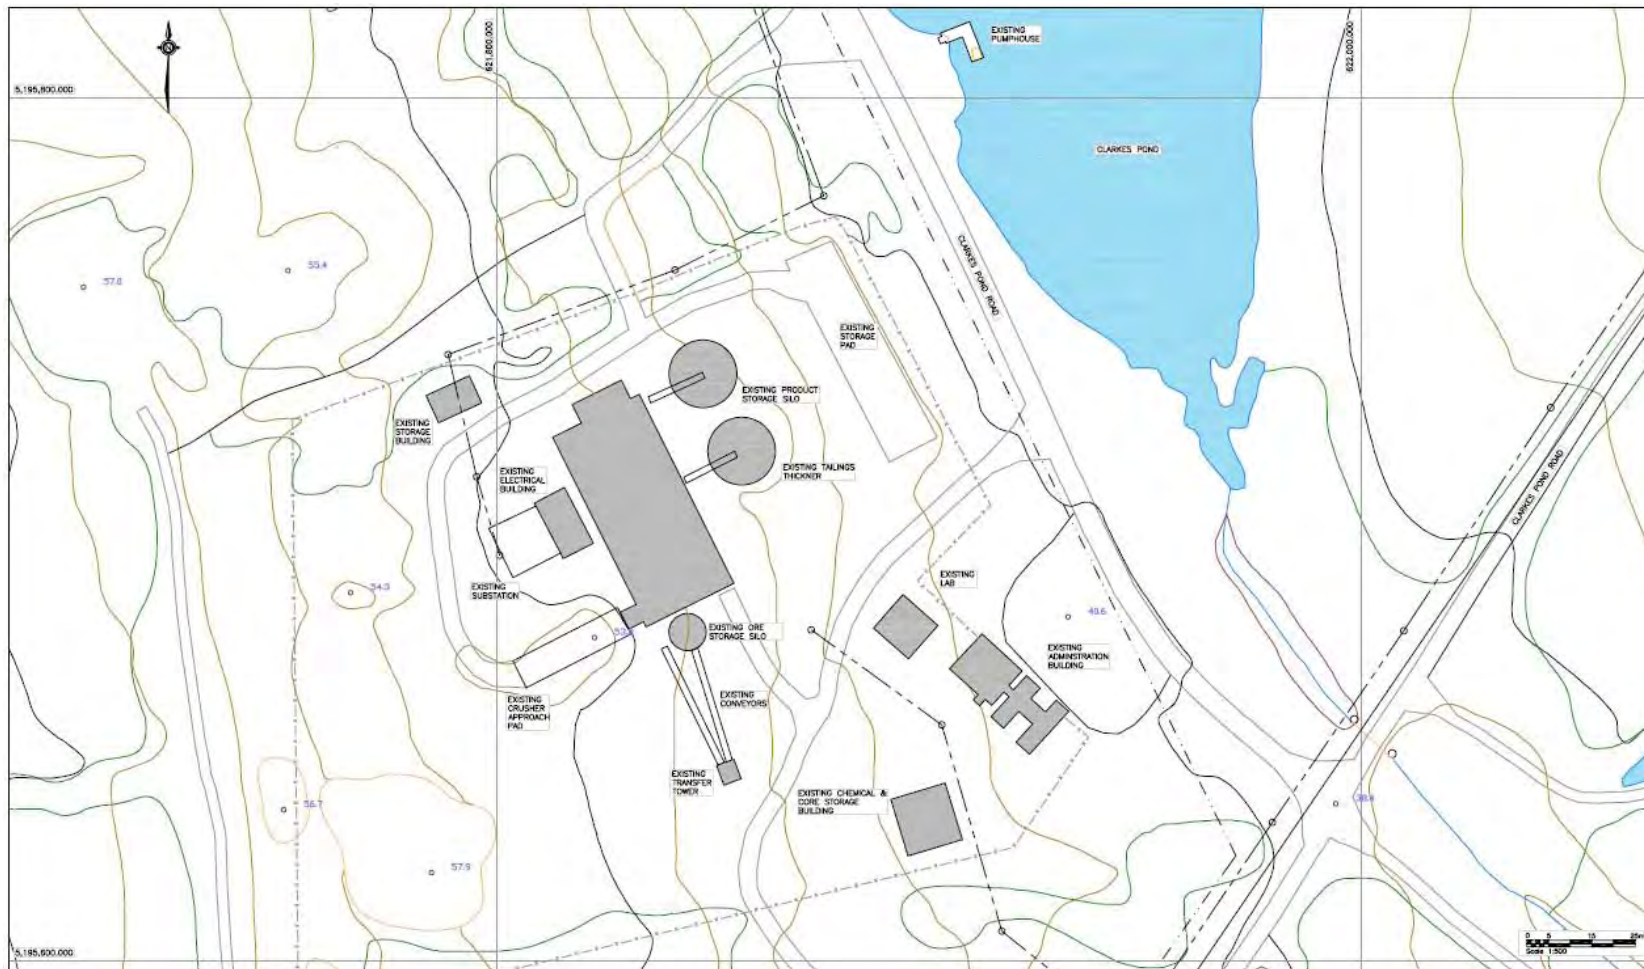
Existing Mill Site Location Plan / Layout
